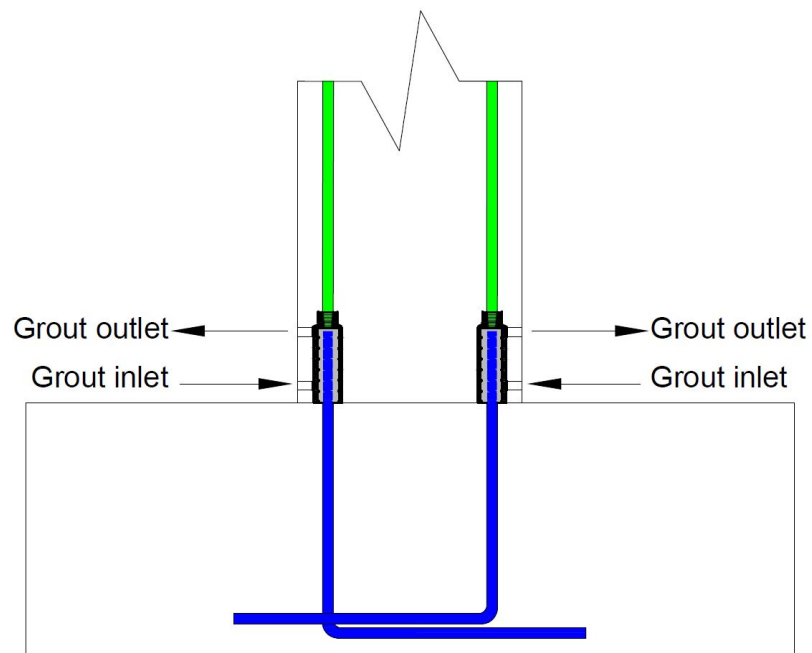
Fastened and grouted splice sleeve connectors in precast concrete components.
